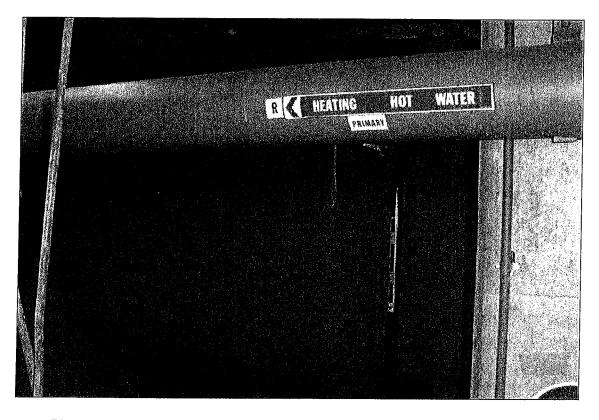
Old Hot Water Steam Pipes in Tunnel Ceiling Space Insulated with SMF in Foil
